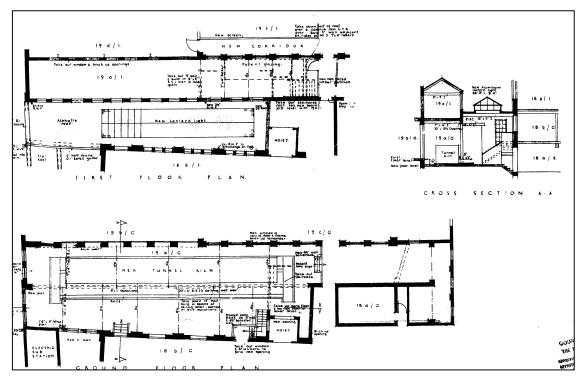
Building L, plans for the new tunnel kiln and housing. Top: first floor showing the retention of the central dividing wall. Bottom: ground floor showing the removal of the dividing wall. Right top: east elevation with the lantern light and loft³²
